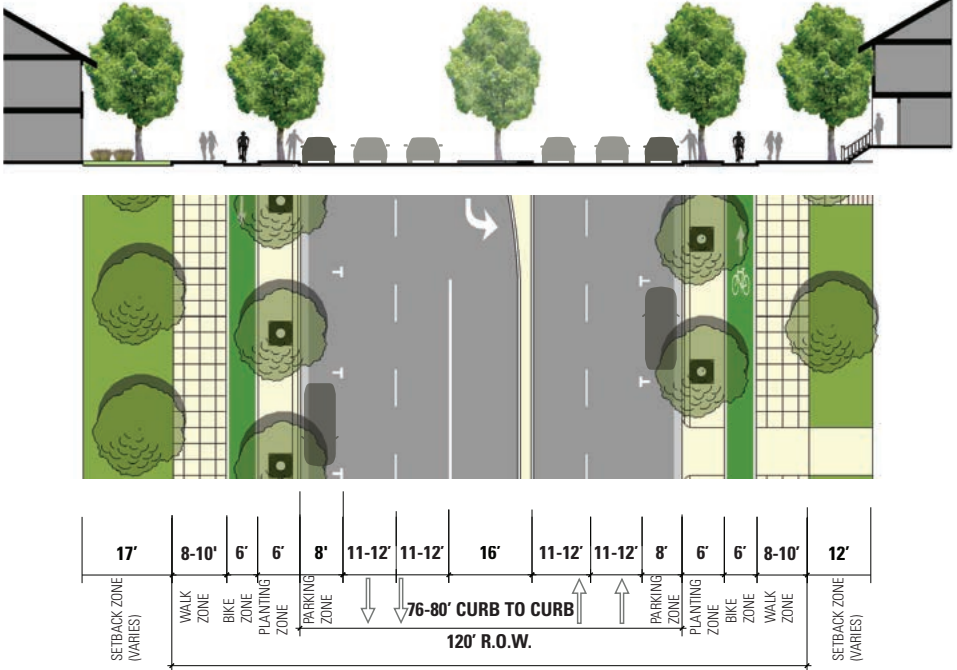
Proposed Hesperian Boulevard Cross Section
